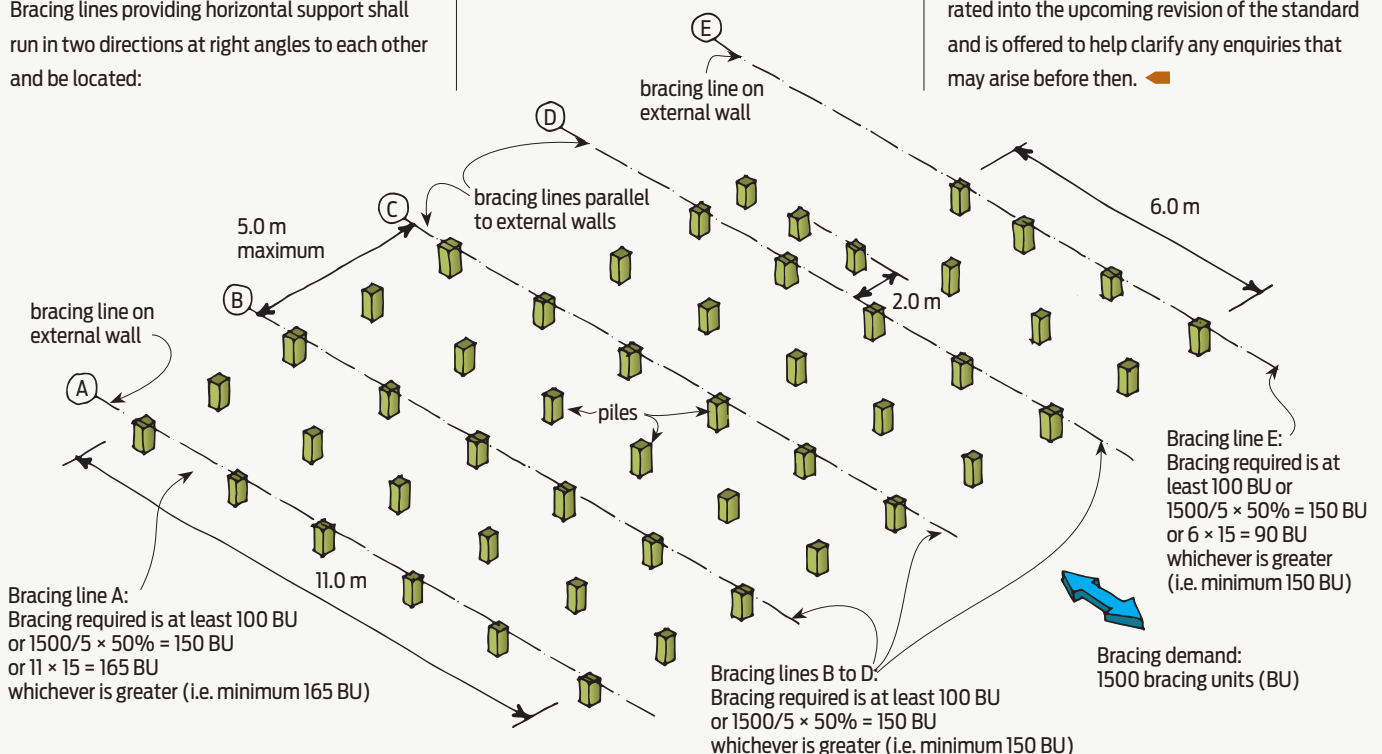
Foundation plan showing subfloor bracing lines. Note: Bracing lines shown in one direction only for clarity.
